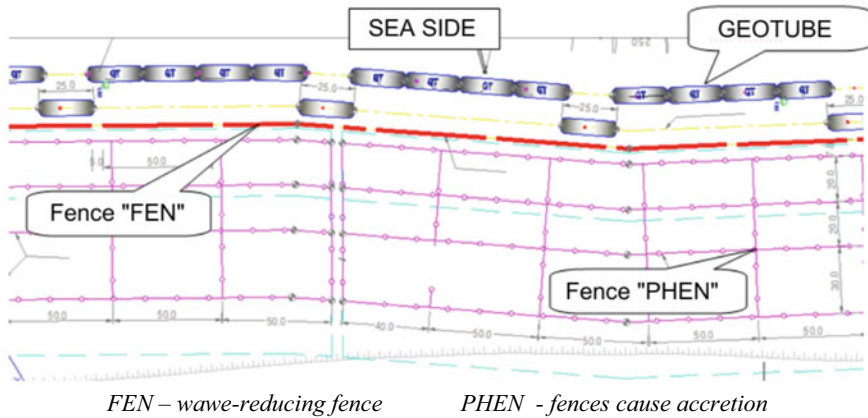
Layout of the Geotube breakwater in Hiep Thanh, Tra Vinh (excerpt)
